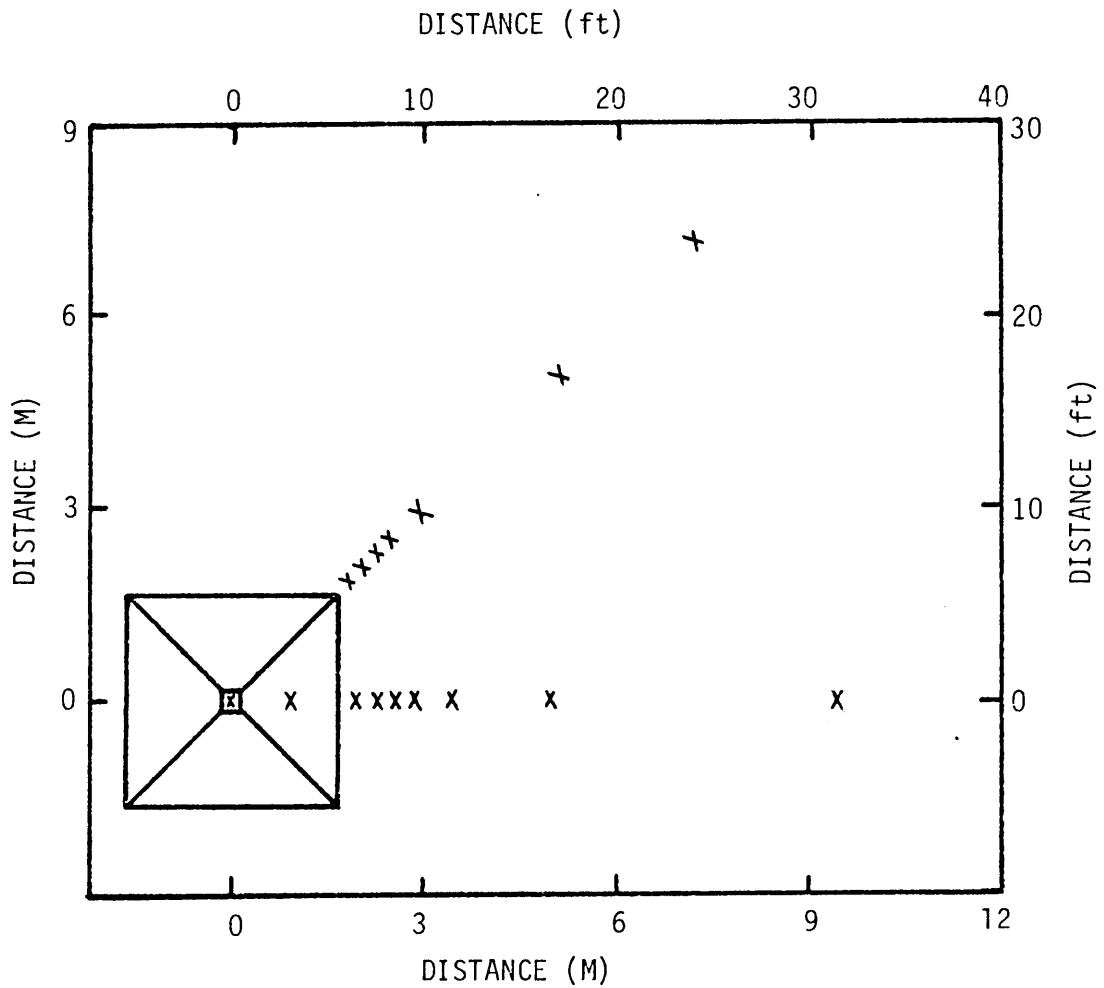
PLAN VIEW OF POND OPENING SHOWING AUGER HOLE LOCATIONS
